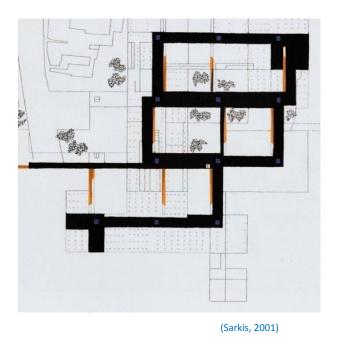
Mezzanine, Ramps btw. 2^{nd} and 3^{rd} Floor
